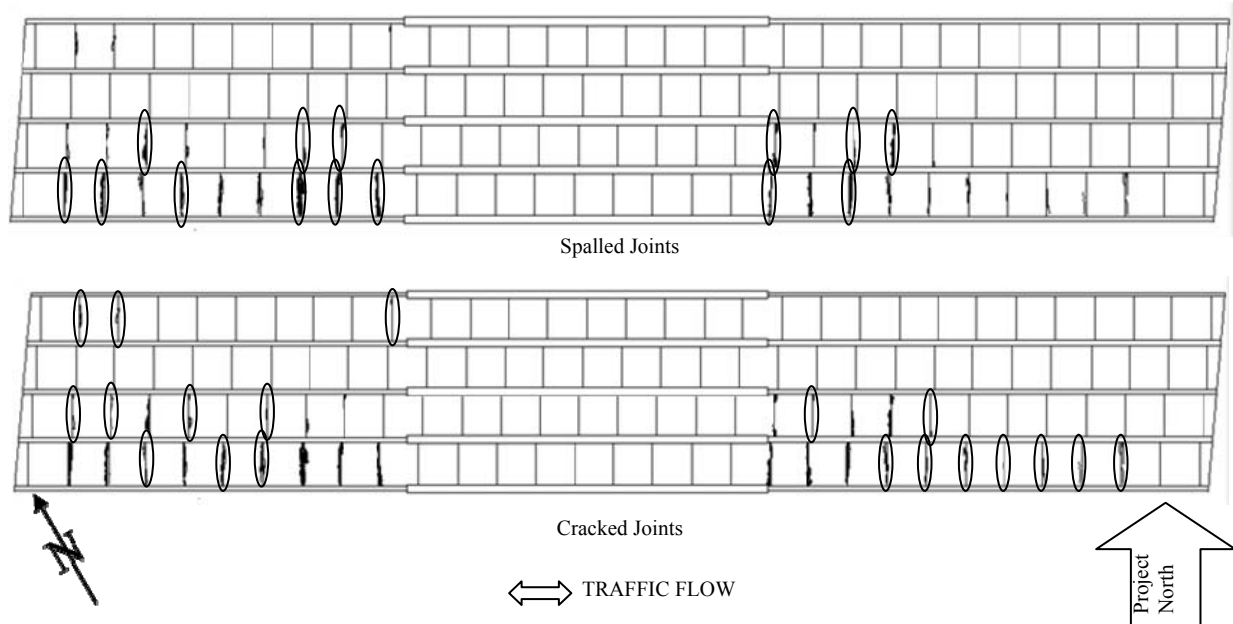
Panel Spalling and Cracking Locations
